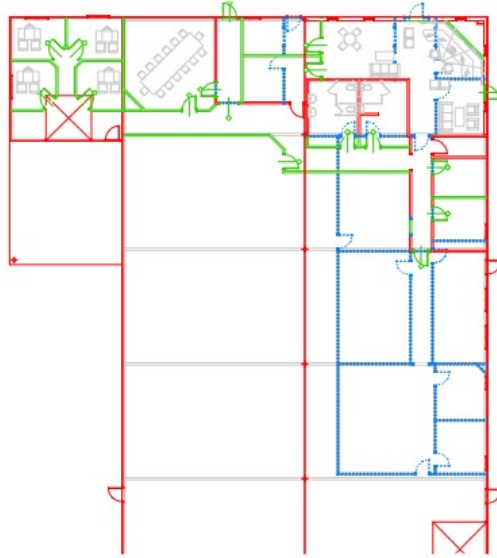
Conceptual Demo Floor Plan with New Structures - Structures to remain highlighted red, structures to be demolished highlighted blue, new structures highlighted green.
